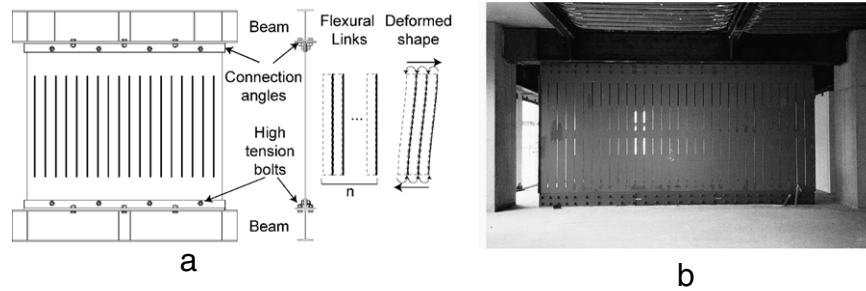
Steel shear walls with slits: (a) Slit wall configuration; (b) Slit wall application.
